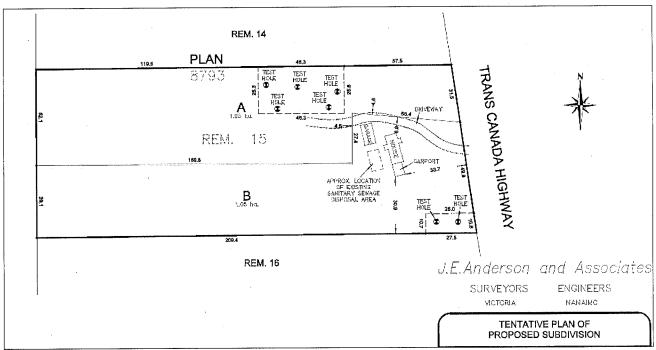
Figure B: Proposed Subdivision Plan for 10910 Westdowne Road
